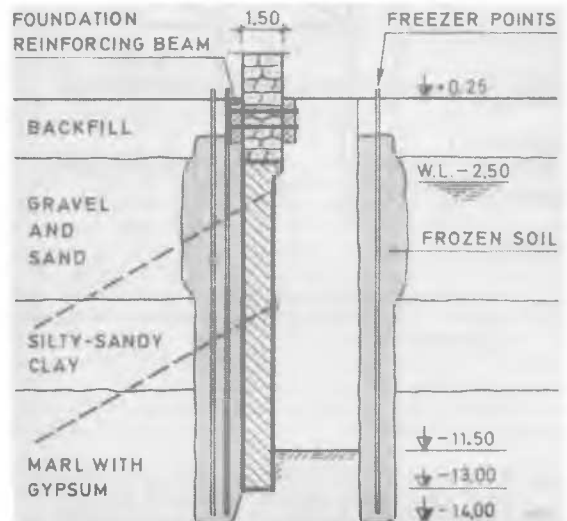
Section of a frozen soil cylinder and a pier foundation panel. Anchors are placed during general excavation.
